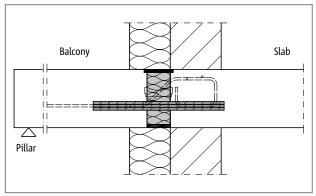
Schöck Isokorb® T type H-VV-NN: With T type K-E, K-T; connection for exterior insulation
